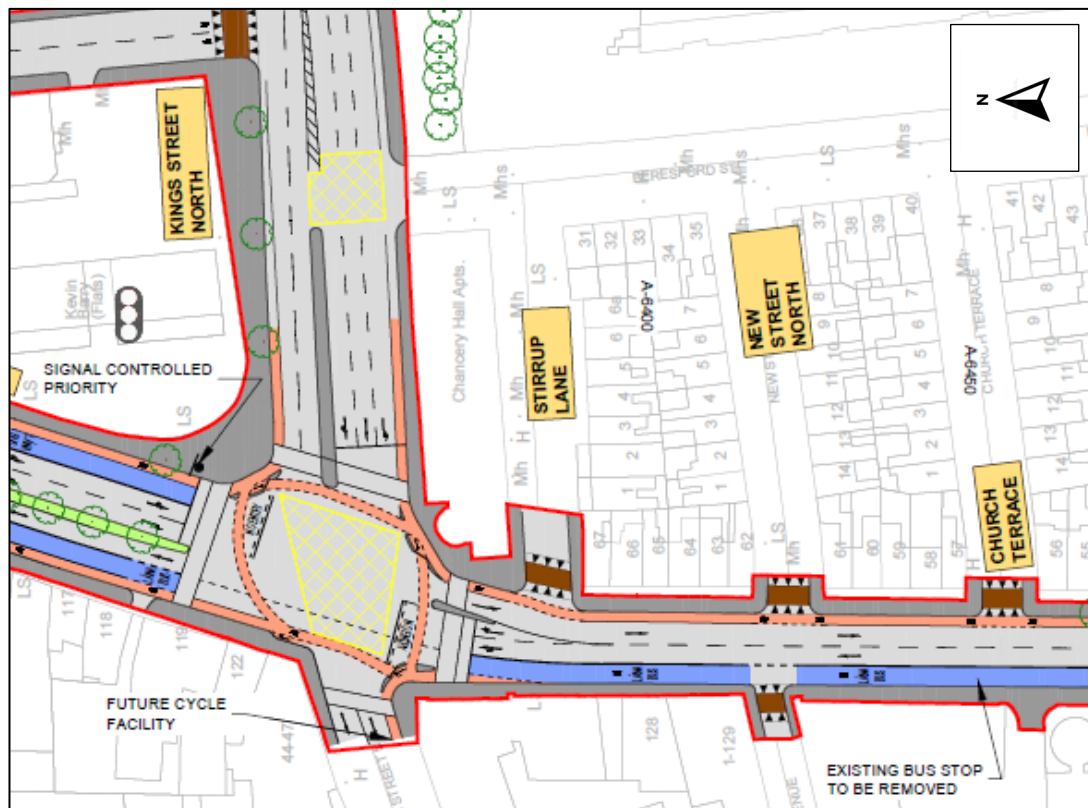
Extract from General Arrangement Drawing Sheet 17
